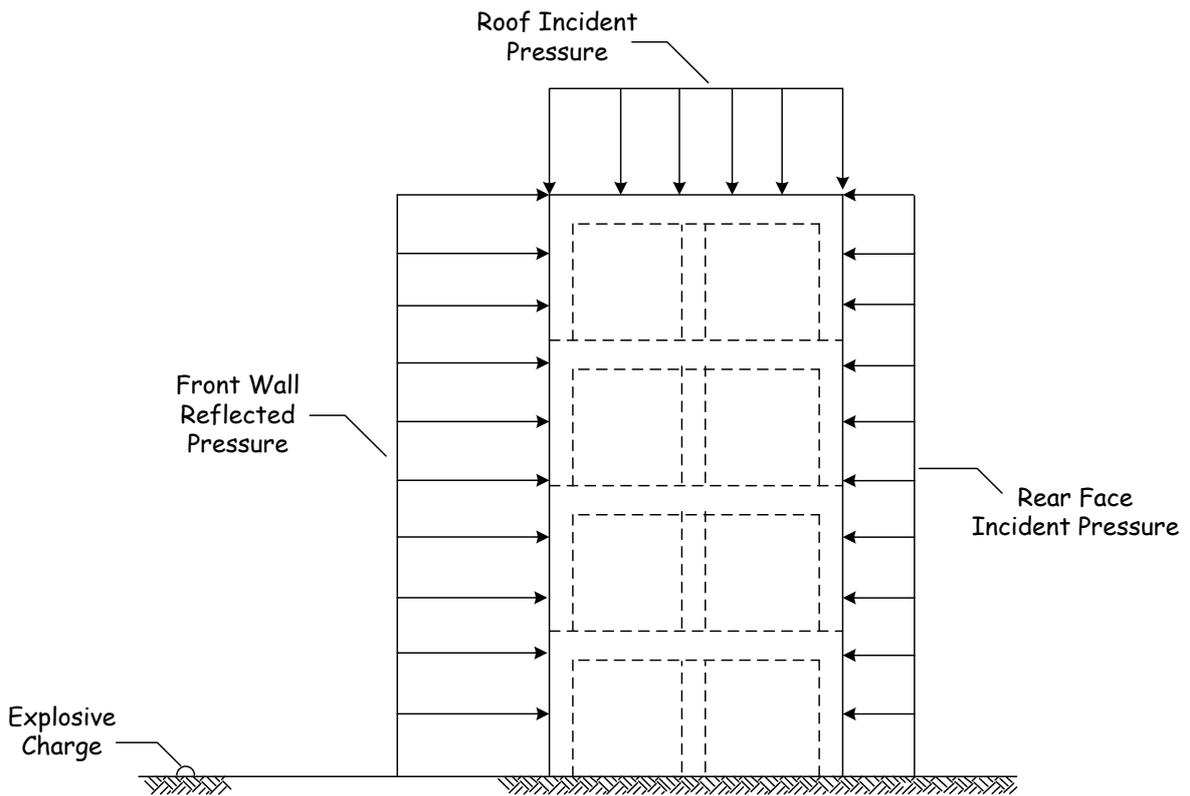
Elevation Diagram of Typical Structural Model Peak Blast Loading Interaction
